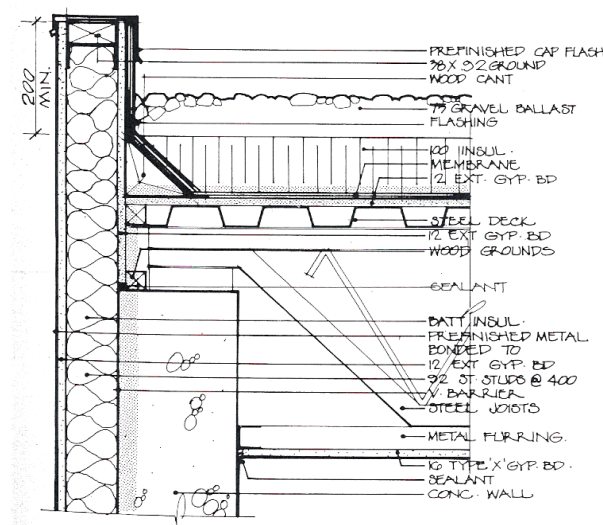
Flat 11<sup>th</sup> floor mechanical room roof (dimensions are in mm) [3.1]
